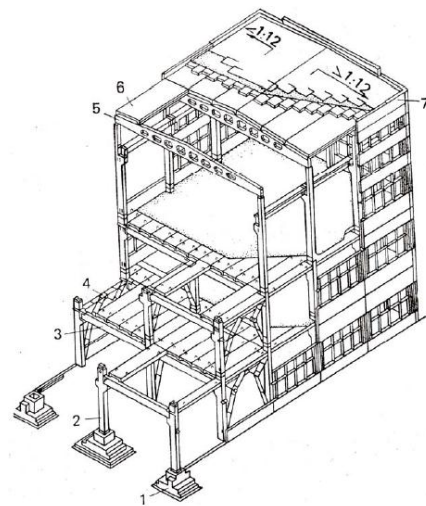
Multistory concrete prefabricated industrial building: 1- foundation, 2 - column, 3- beam, 4 - strengthen ties, 5 - beam, 6 - roof panel
